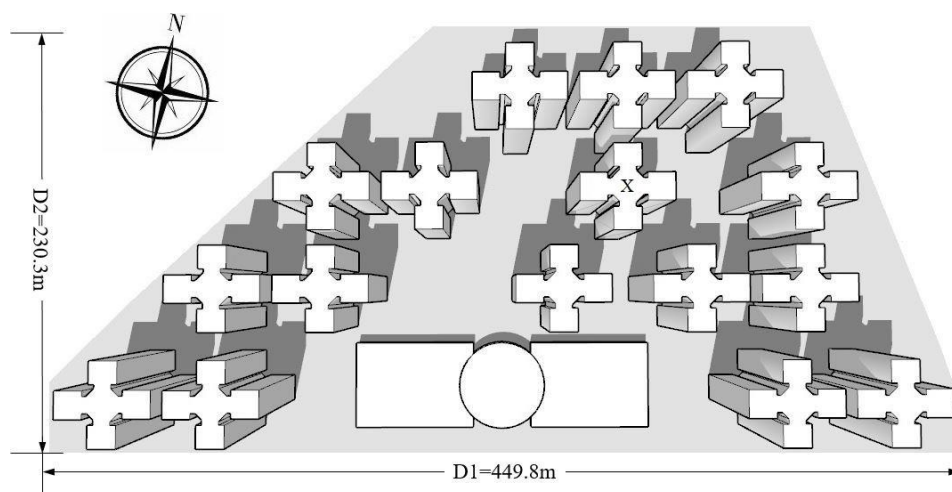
Site plan of Tseung Kwan O (TKO) and the studied building block X
